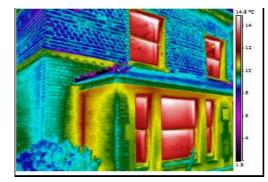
Southwest elevation showing significant heat loss through windows and heat loss through the wall junction
